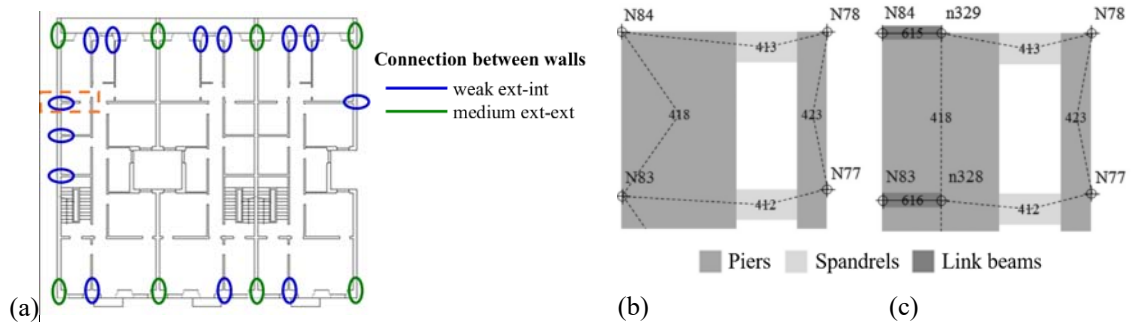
Example of connection between walls: (a) identification of connections (plan view) and mesh of elements for the connection between exterior and interior walls (b) without and (c) with link beams
